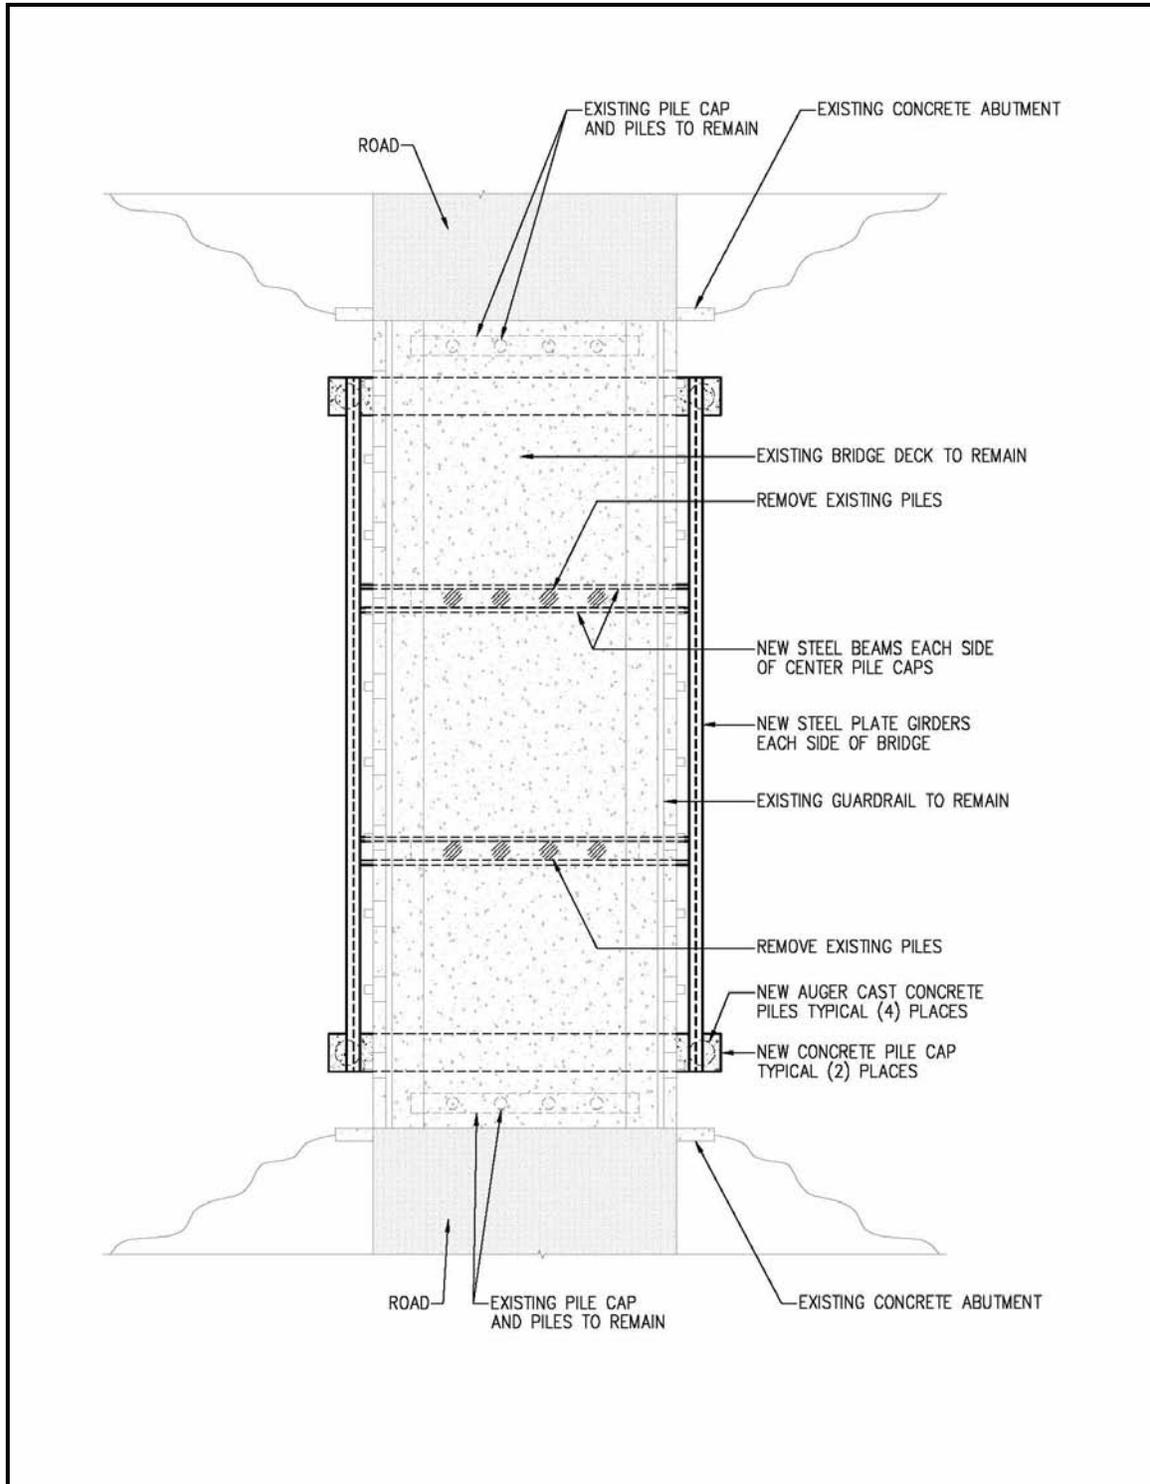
Conceptual Woodard Bay Drive Bridge Modification, Plan View
